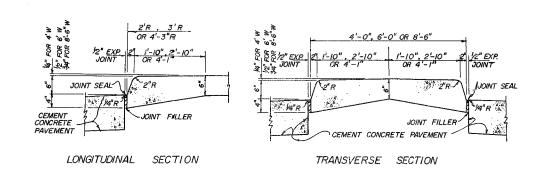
DETAILS OF TYPE I CONCRETE TRAFFIC SEPARATOR NOTE: STABILIZE FULL WIDTH OF TRAFFIC SEPARATOR.
